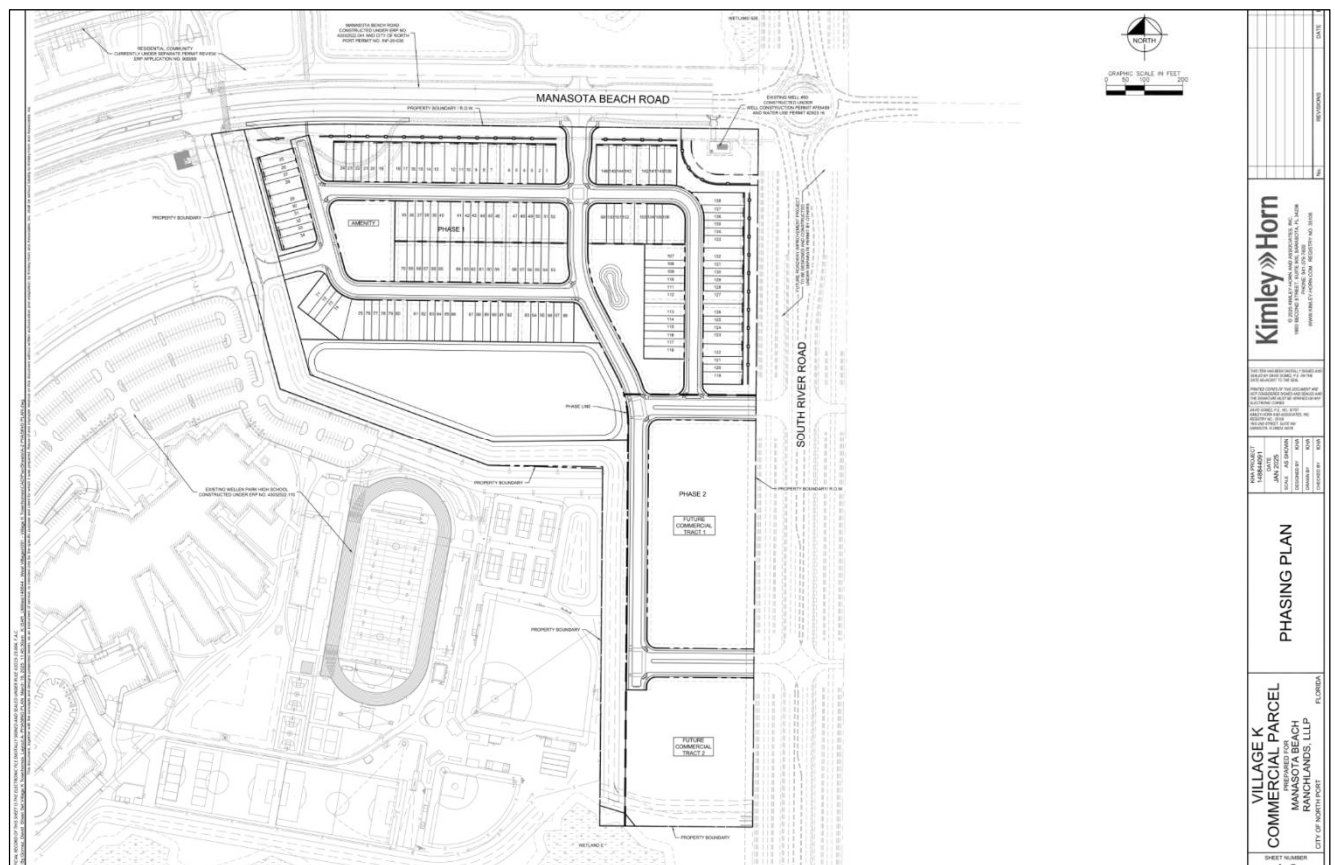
Proposed Preliminary Subdivision Plat, Wellen Park Village K Townhomes.
